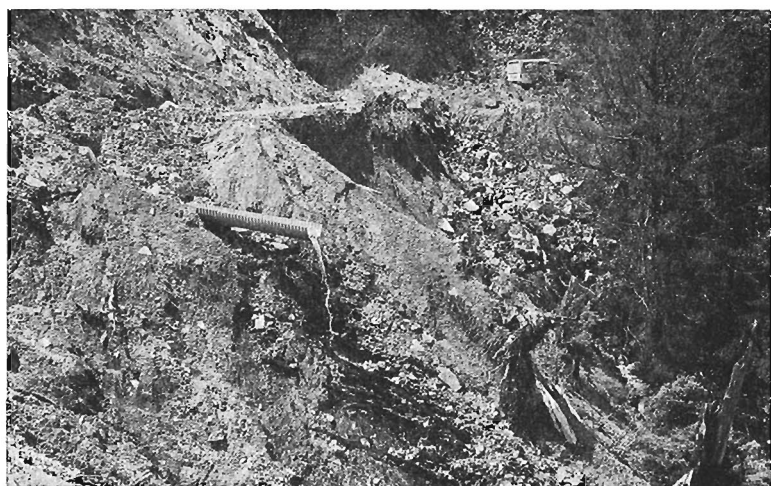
Slumping and gullying of road fill on Nettletons Rd associated with culverted crossings of steep headwater drainages.
